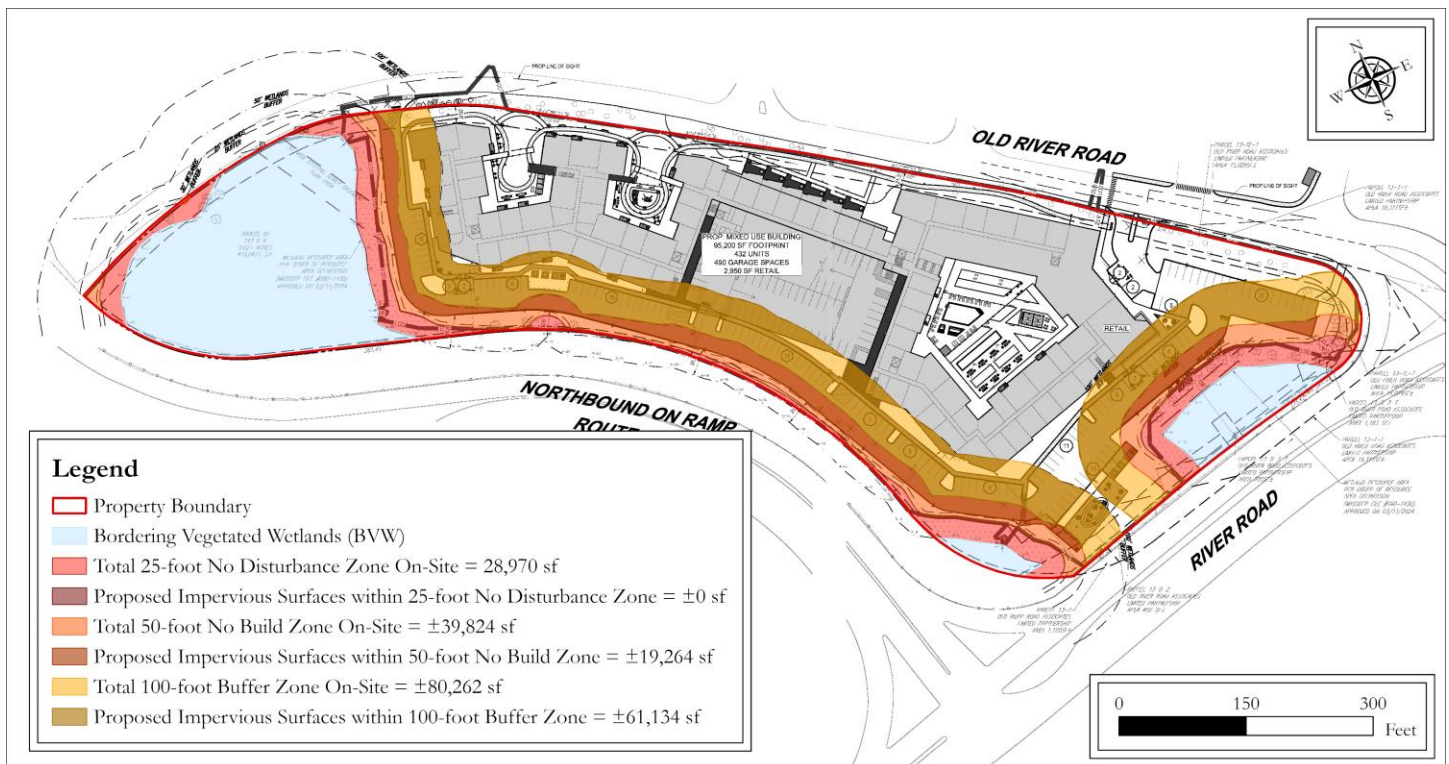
Overview of proposed impacts to the town- and state-jurisdictional buffer zones overlaid on the Overall Site Plan sheet included in the previously submitted civil plan set prepared by Bohler Engineering, revised 03/03/2026.
